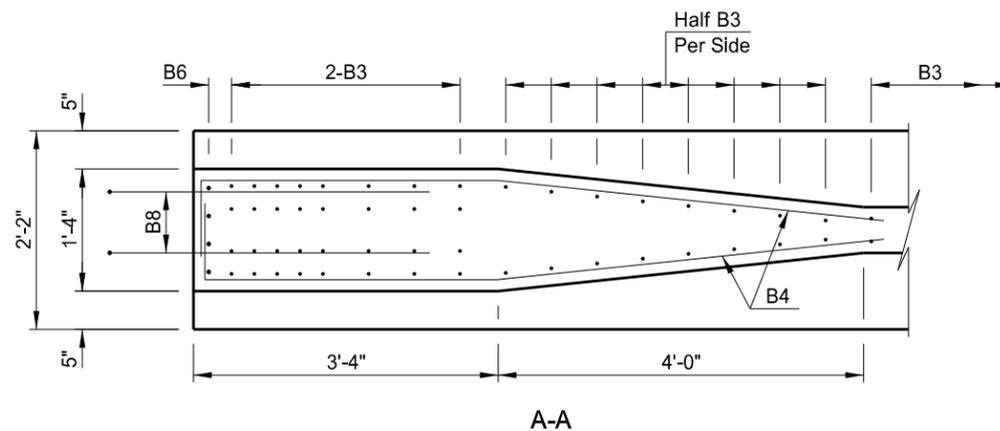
(DETAILS NOT SHOWN ARE SAME AS "SECTION @ ϕ ")
